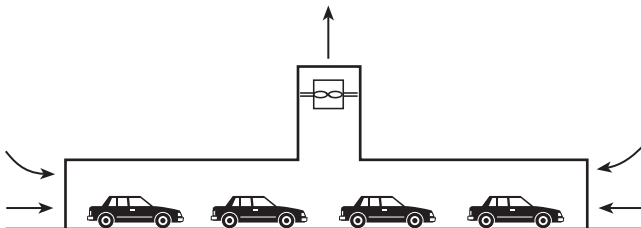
(e) Longitudinal Ventilation System with Central Fans and Exhaust Shaft.
